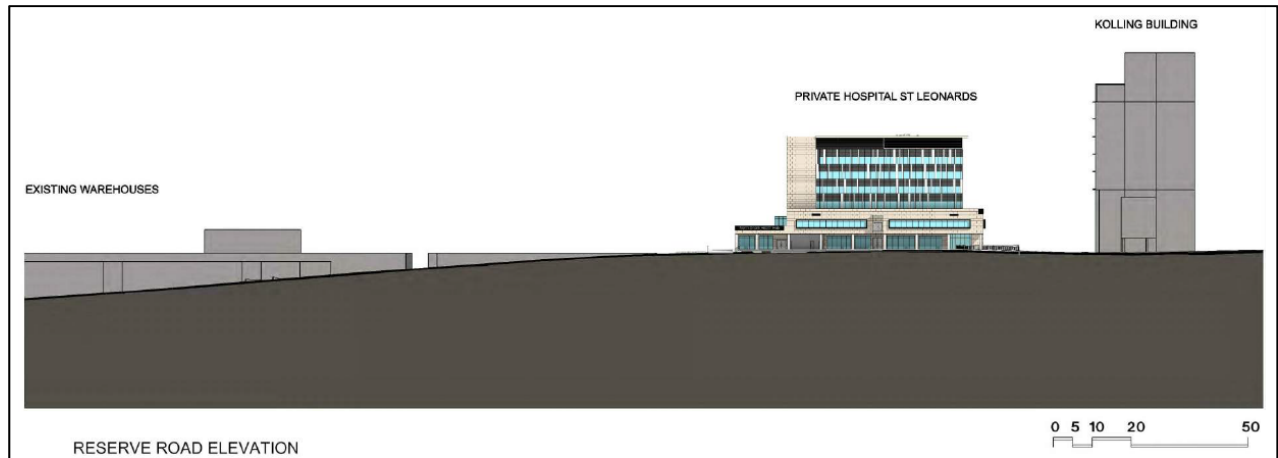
Extended south-west elevation (Base source: Tower A RtS)
